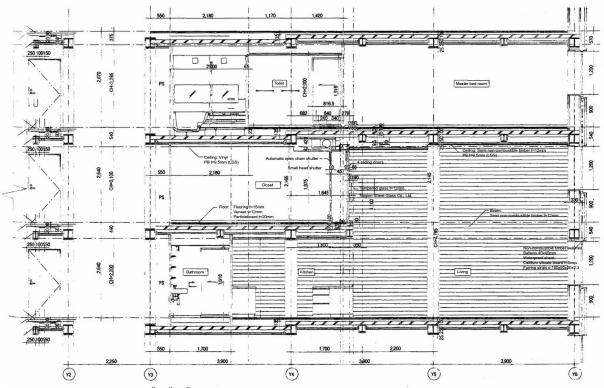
g – Detailed section: 6th, 7th, 8th floor; Dimensions in [mm]
